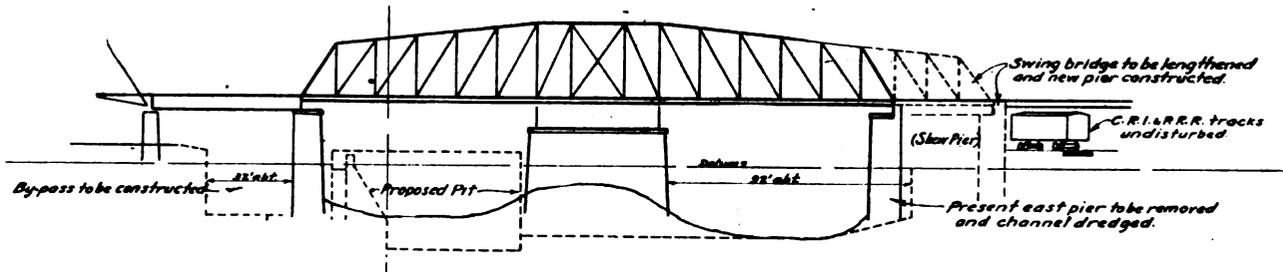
Present Swing Bridge—Showing Preliminary Steps to Obtain Additional Waterway Before Pit is Constructed.
